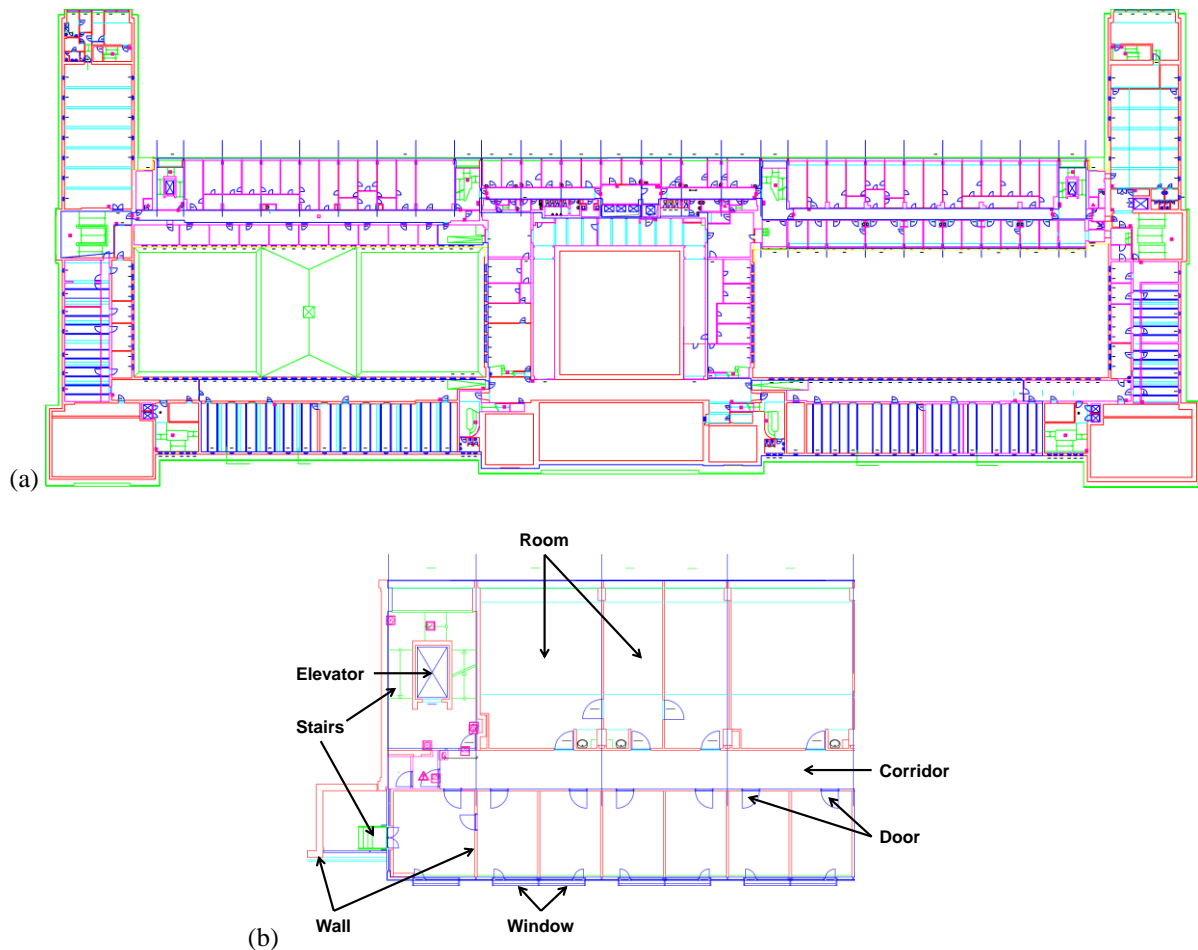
A single CAD floor plan of the TU Main Building (a) and an excerpt of that floor plan illustrating the modelled spatial entities (b).
